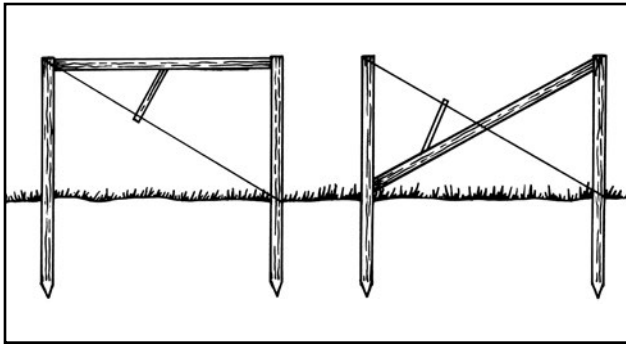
Diagonal end brace and single-span horizontal end brace.
